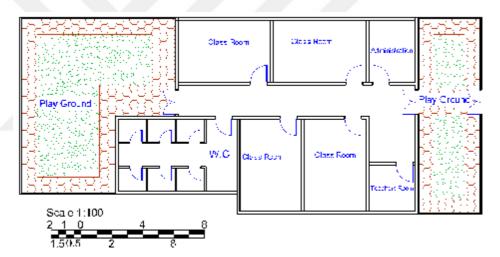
Floor plan of Zlitin C Kindergarten (Drawn by author)
